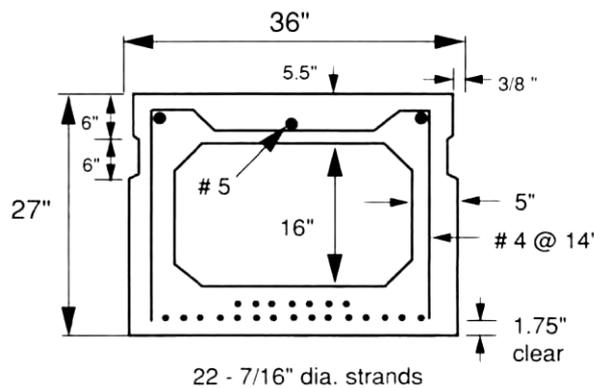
Walnut Street Bridge (ID-31)'s beam cross section (AASHTO Type B1-36) (Murray and Frantz, 1992).
